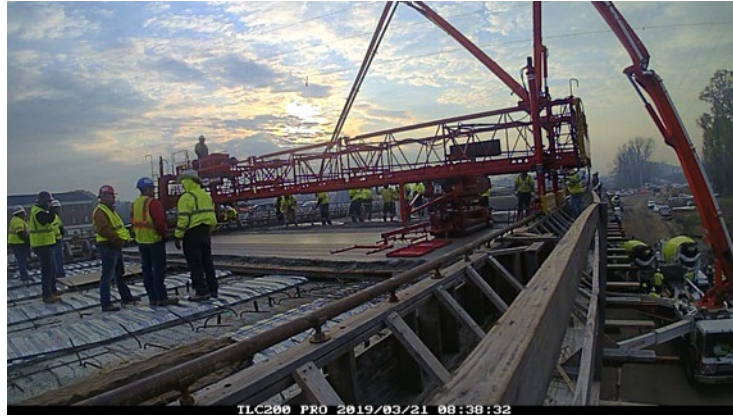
Photo. Still from time-lapse camera during concrete deck pour
